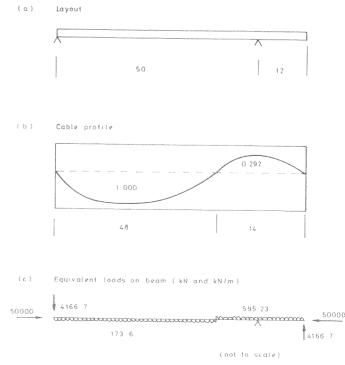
Beam loading falsework: layout, cable profile, and equivalent loads
